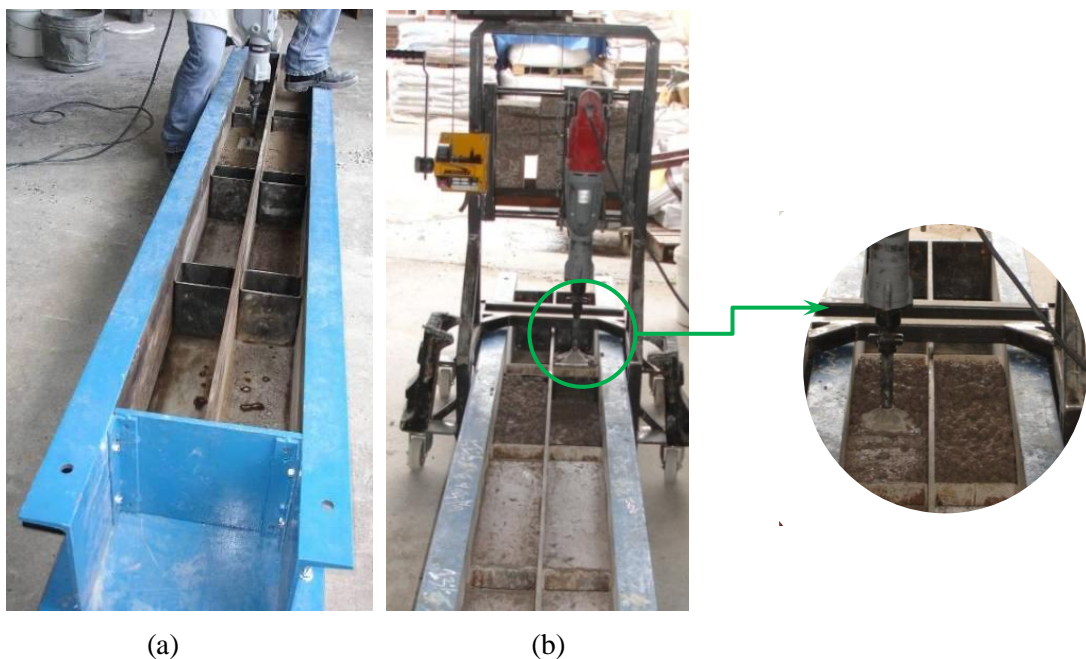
(a) Steel-plate prismatic moulds; (b) Casting RCC prisms using electric hammer
